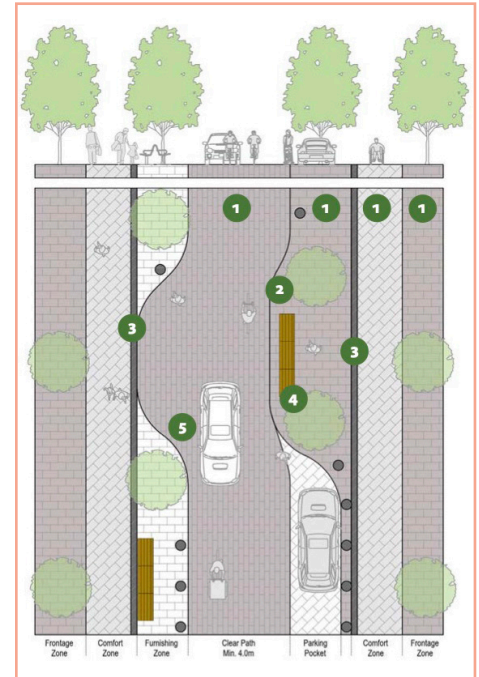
Differing paving material delineate intended use of space, while curvilinear road naturally slows traffic.³³
